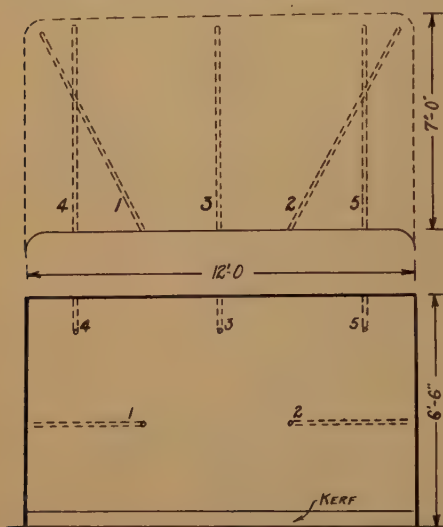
DRILLING PLAN. NUMBERS DENOTE ORDER OF SHOOTING.
